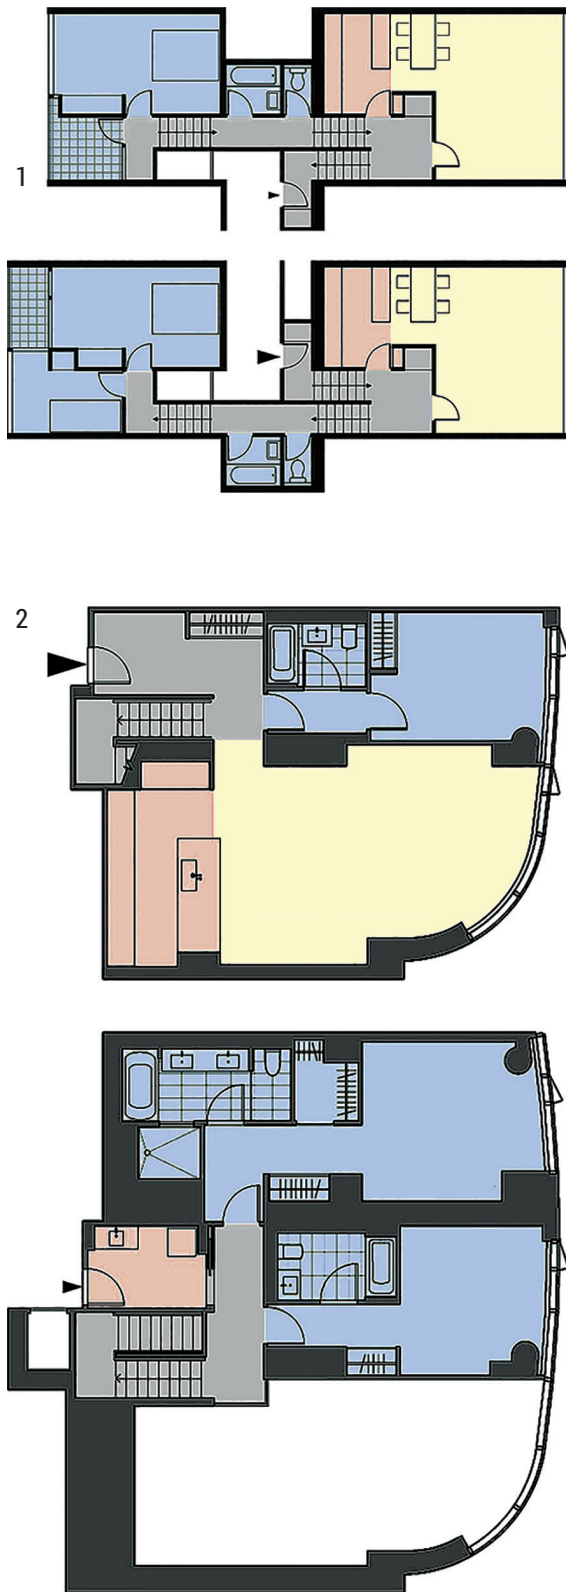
Typical apartments with auxiliary entrances on the second level: 1) Corringham building, London (Kenneth Frampton, 1960); 2) 50 West, New York (Helmut Jahn, 2018) (Source: Authors' archive)
